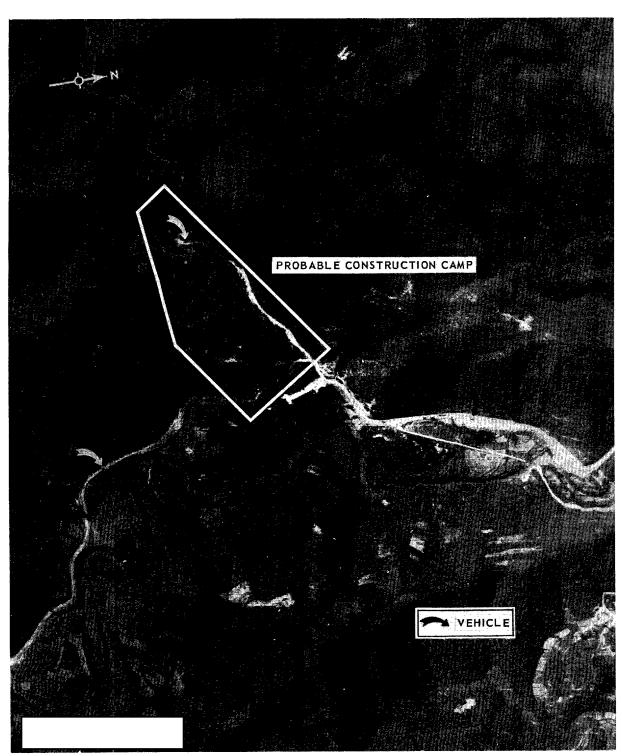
ROAD CONSTRUCTION, NORTH VIETNAM
